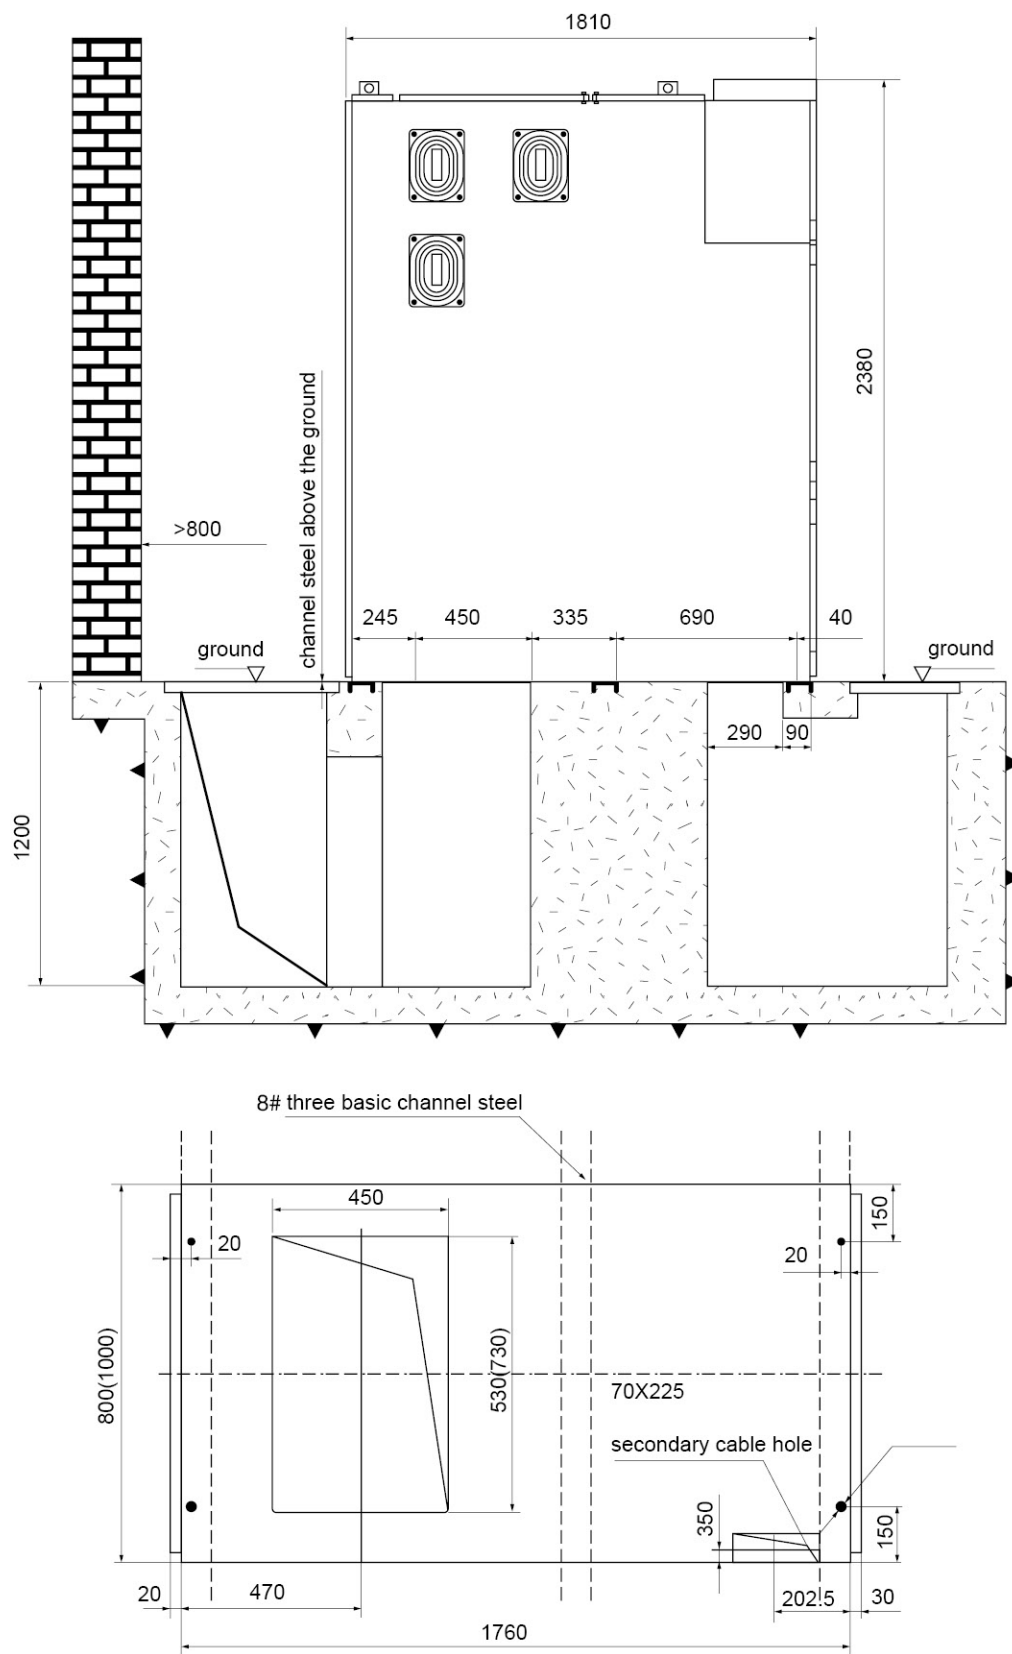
Switchgear installation base and bottom board hole dimension diagram
